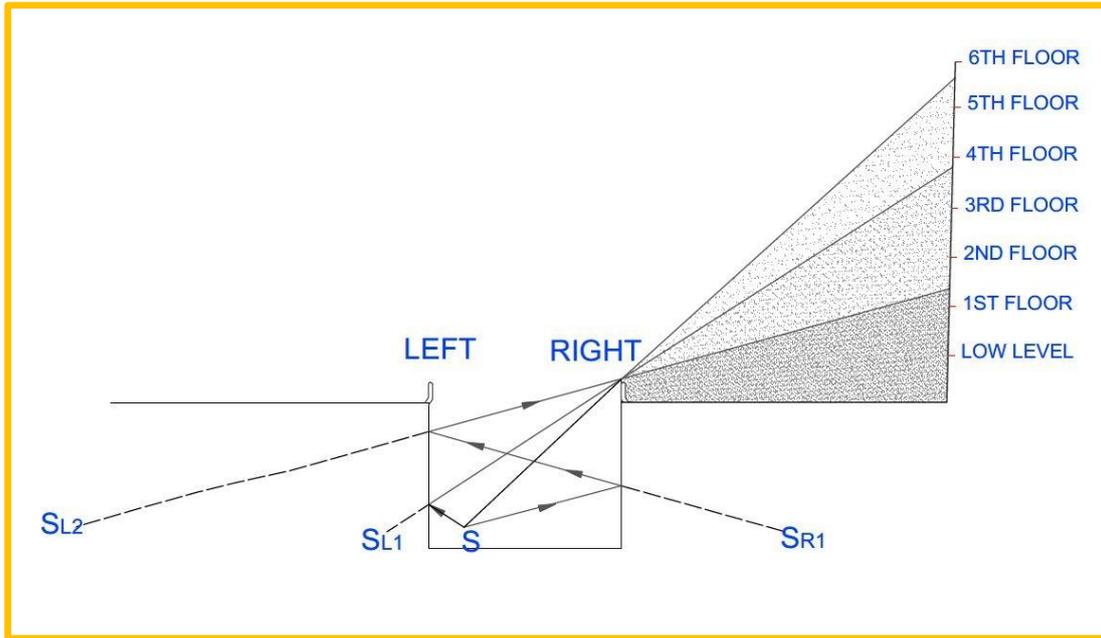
Cross section of a road in open pit trench showing the hopper effect
